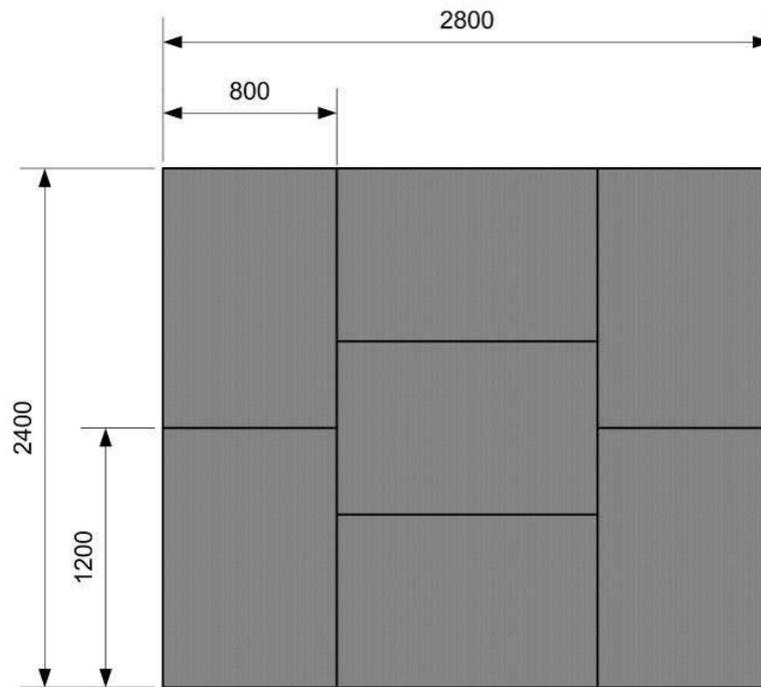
Arrangement of aluminium panels (dimensions in mm)
